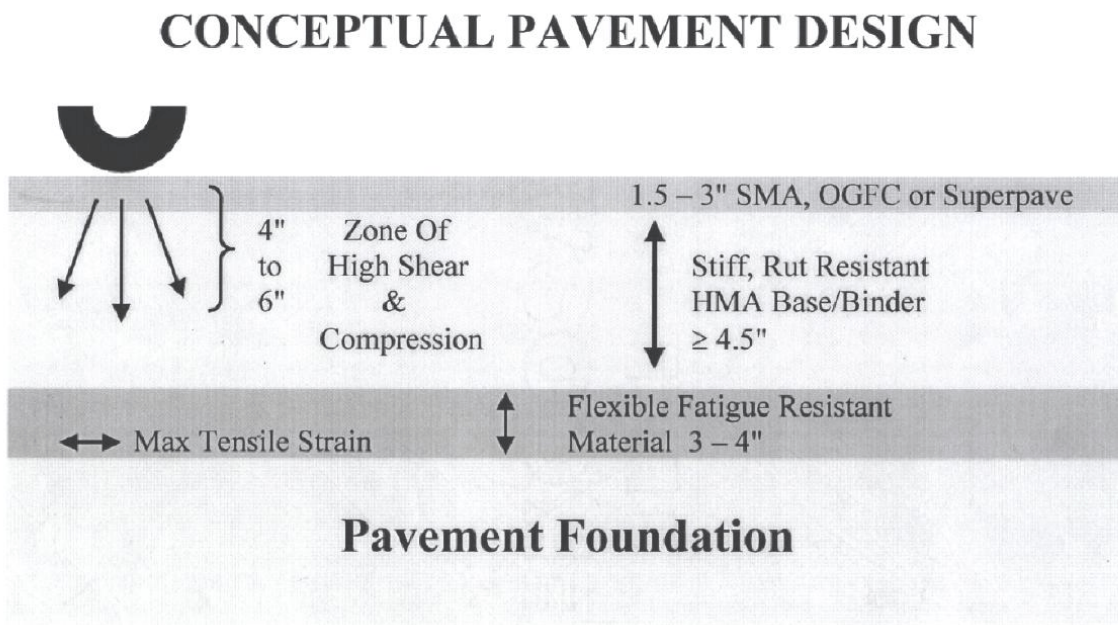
TxDOT Perpetual Pavement Layout.
